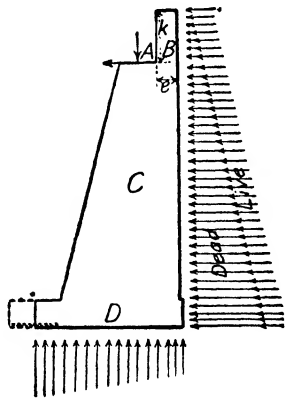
Section of Abutment Indicating Some of the External Forces Acting upon It.
